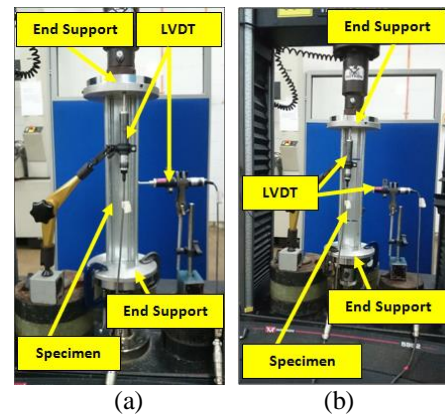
The compression testing arrangement and setup of the CFS channel section column specimen (a) without notch and (b) with notch.
